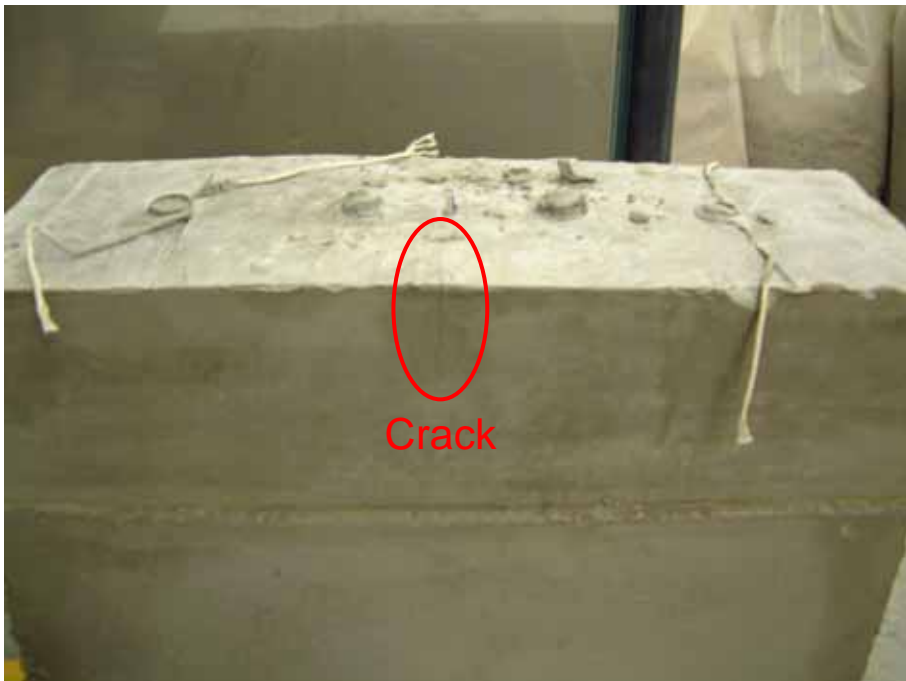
Paste specimen R2-E/(C+E) =6.5% (after mold removed)
